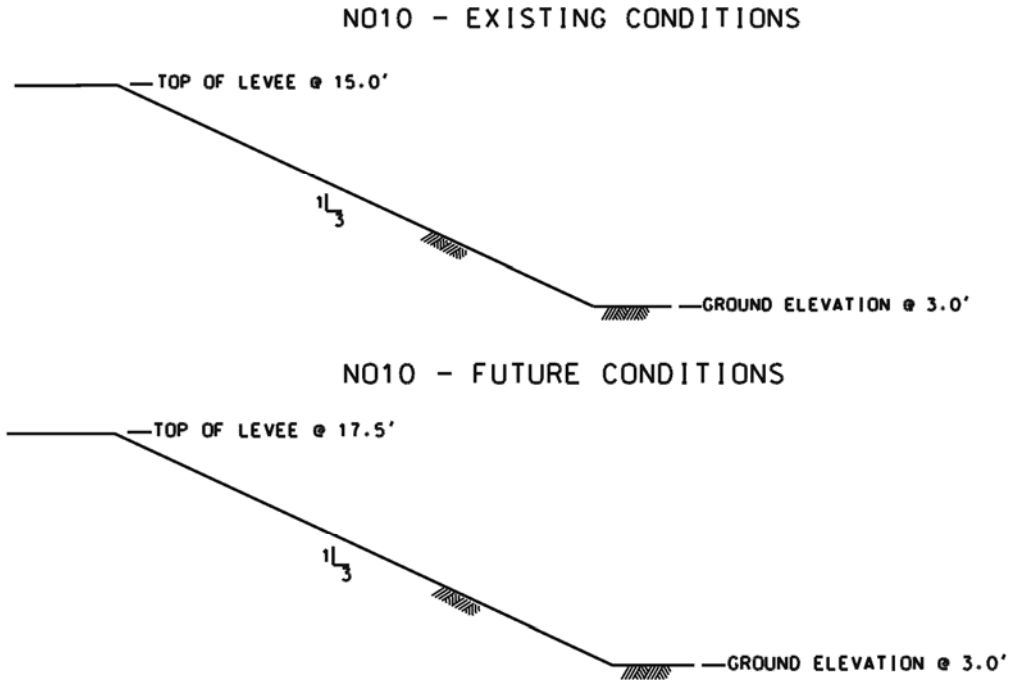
Cross-section profile for Topaz Street Levee (NO10) for existing (upper panel) and future conditions (lower panel).
